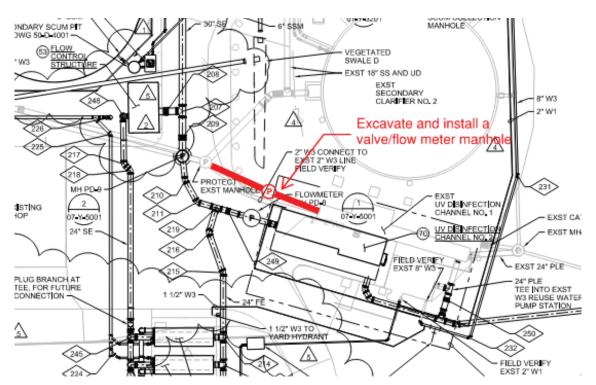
Location of proposed upstream valve/flow meter manhole vault
